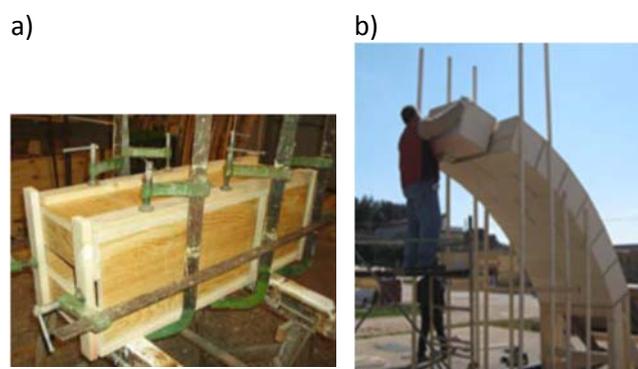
a) Assembling of the wooden panels to form a closed-form ashlar; b) Assembling of the arch.
